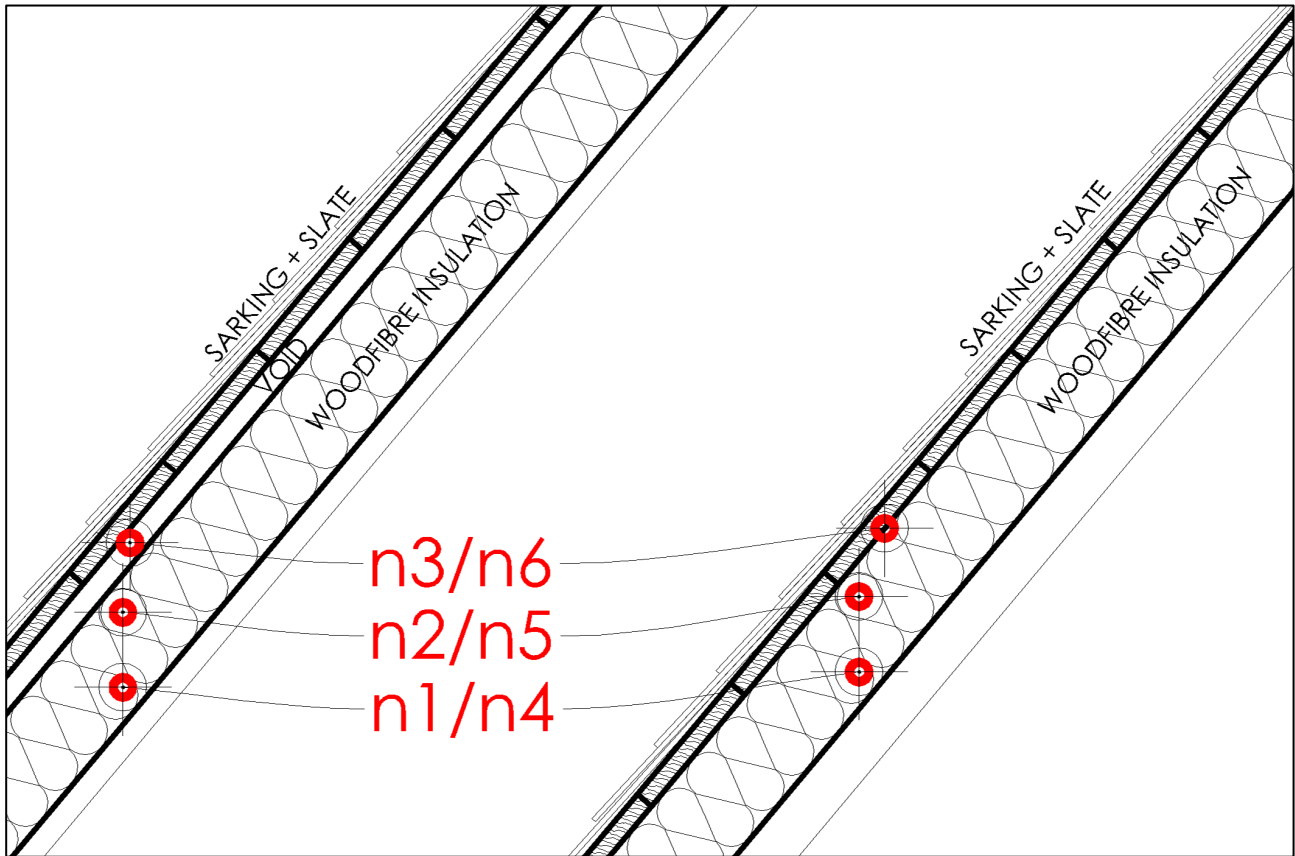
Cross-Section Through The Two Insulated Roof Conditions, With And Without Air Gap, showing Sensor Node Positions, South-Facing Gable, Holyrood Park Lodge.
